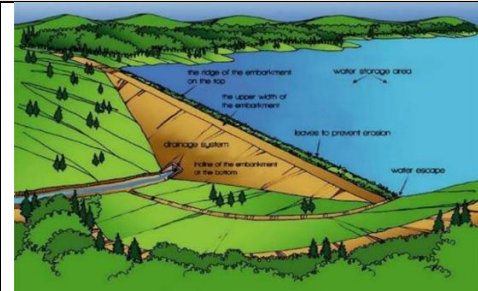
Cross-section of an earth embankment showing water storage area, drainage system, embankment structure, and erosion-control measures
